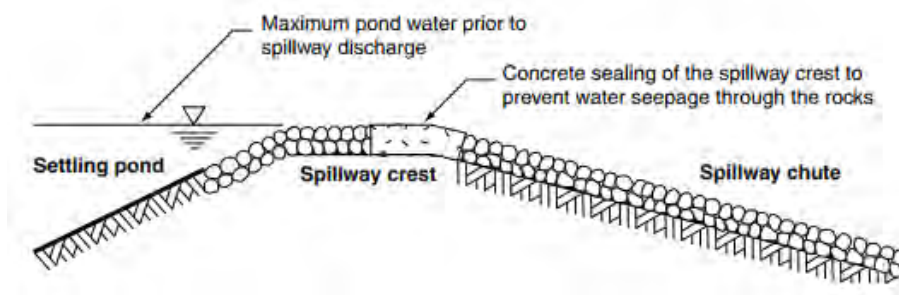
Typical emergency spillway, from Standard Drawing ES-1 (IECA 2008)
